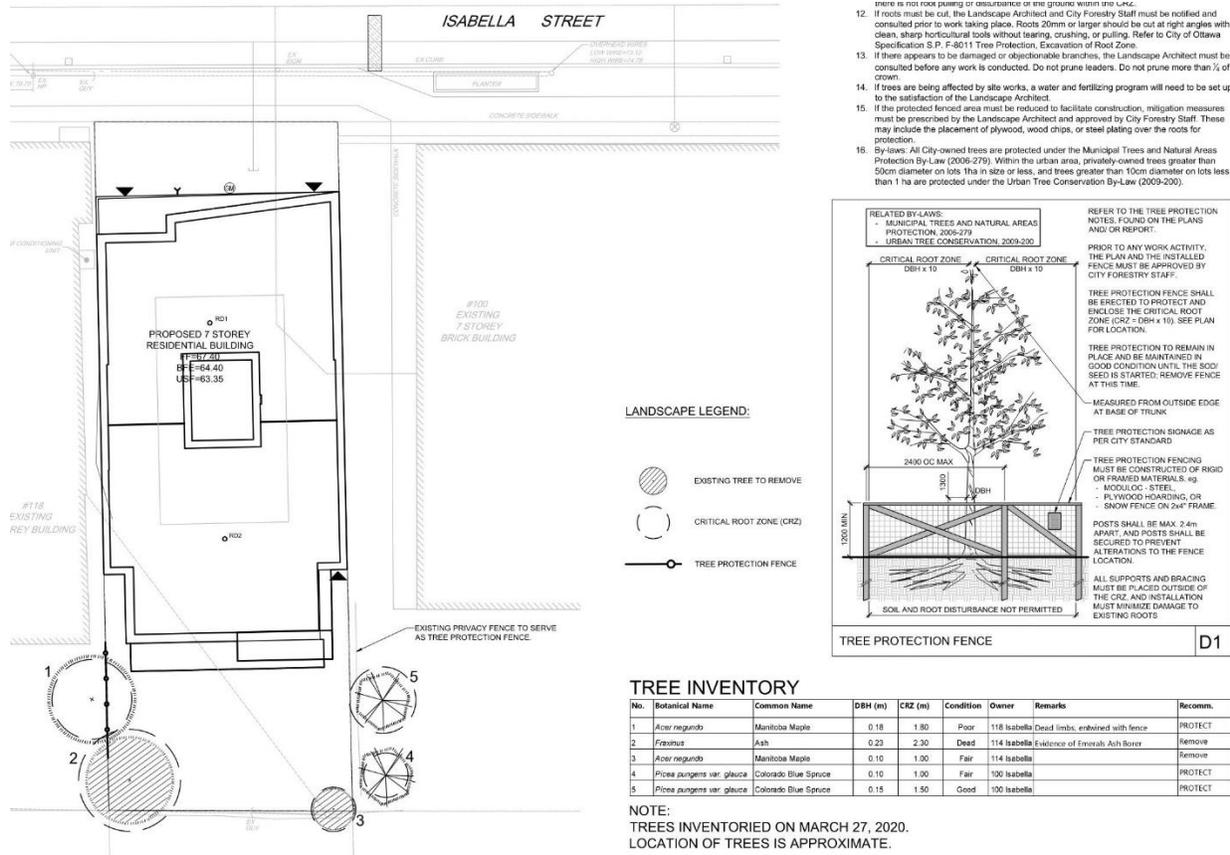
Proposed Tree Conservation Report, Extract (Novatech, revision April 09, 2020)
